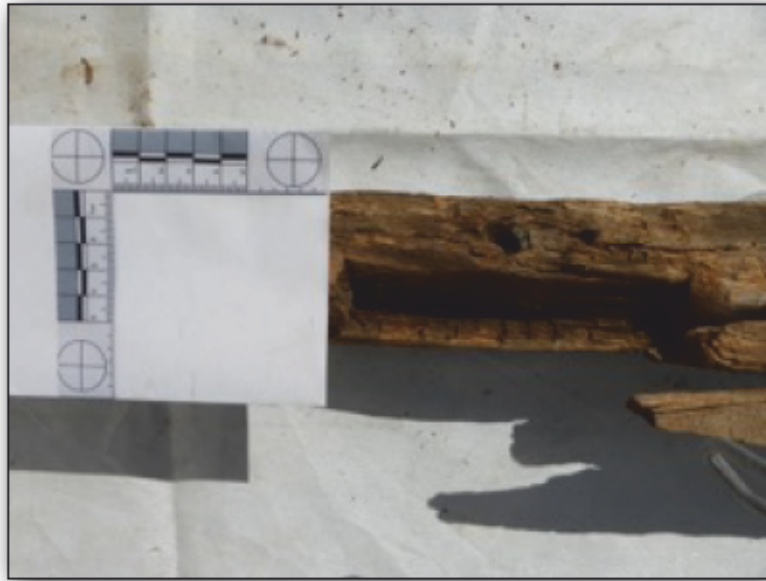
Removed rafter timber: Fracture end, bottom notch
